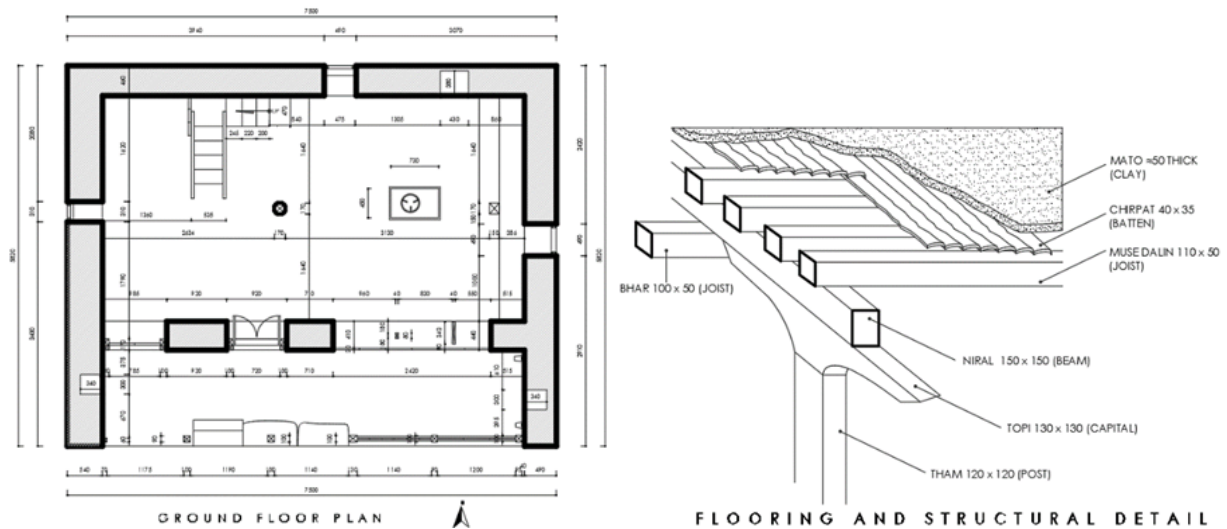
Plan and flooring detail in House code no. 80, Govinda Burathoki
